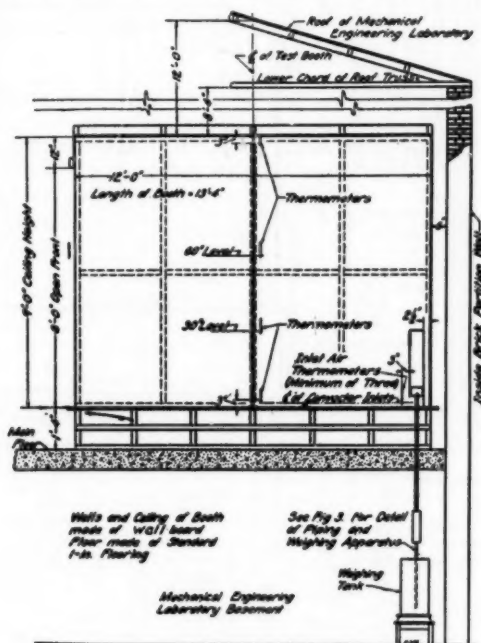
SECTION OF WARM WALL TEST BOOTH
